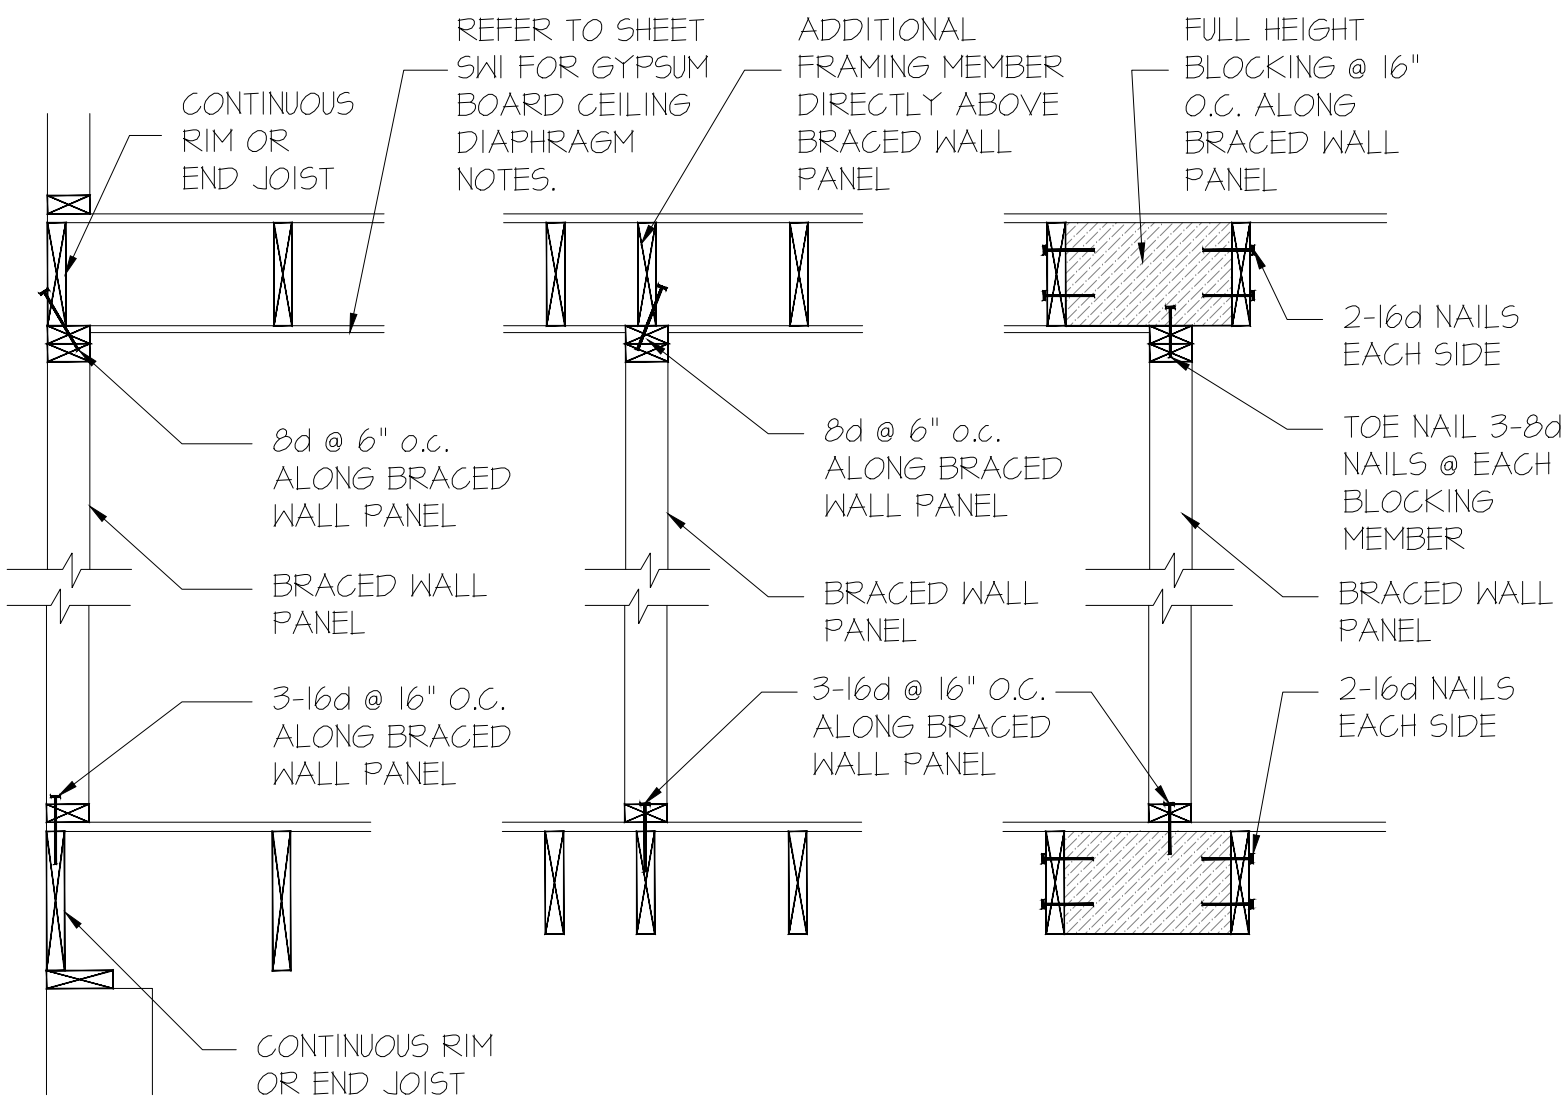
(2)- BRACED WALL PANEL CONNECTION PARALLEL TO FLOOR / CEILING FRAMING
